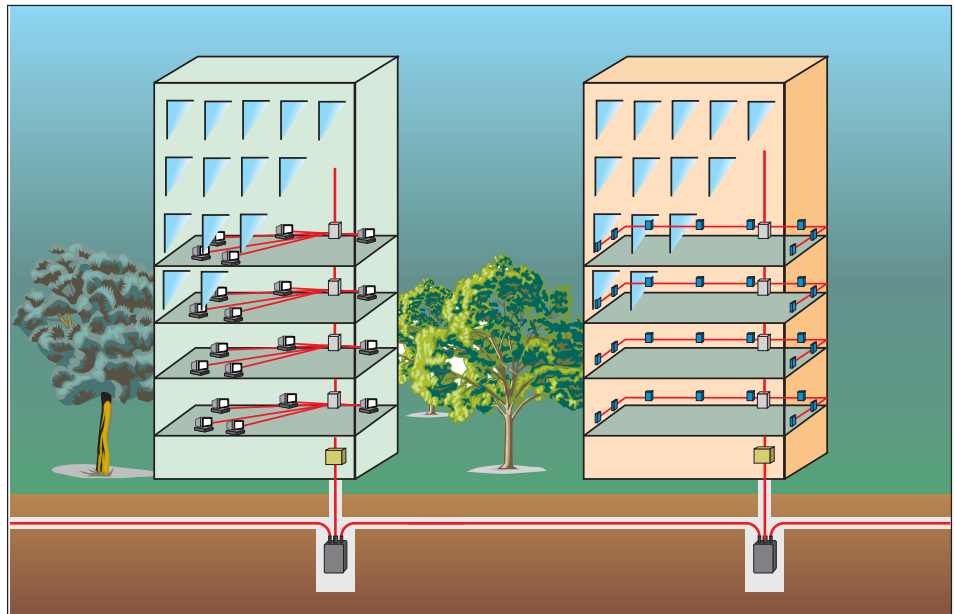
Traditional indoor cabling. To the left is a starlike network shown and to the right is a bus network. Trunk cable to each floor and plenum cable to the user.
